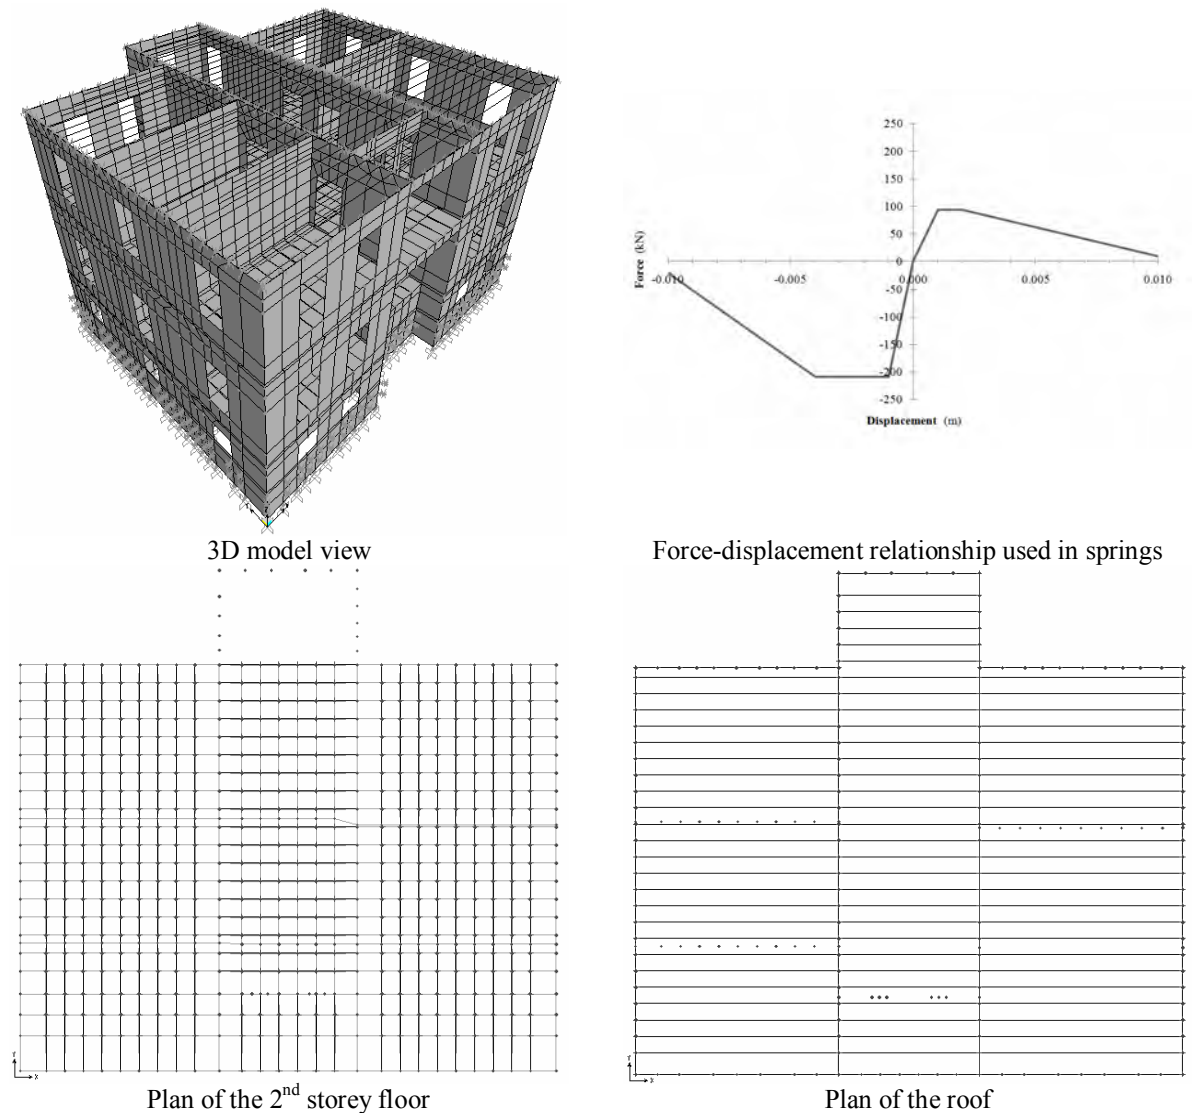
Model B; Three-dimensional view of the model, plan views of the 2nd storey floor, the roof and force-displacement relationship used in the friction springs that connect the timber beams with the walls of the second storey.
